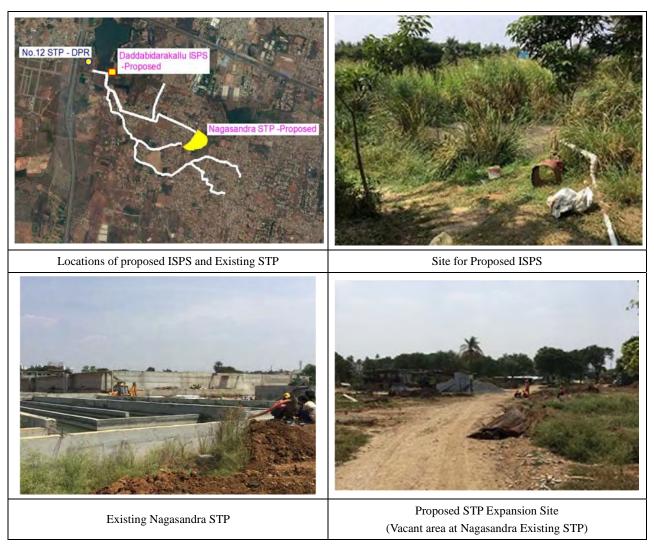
Location of Daddabidarakallu ISPS, Nagasandra STP and Alignment of Main Sewer Line
